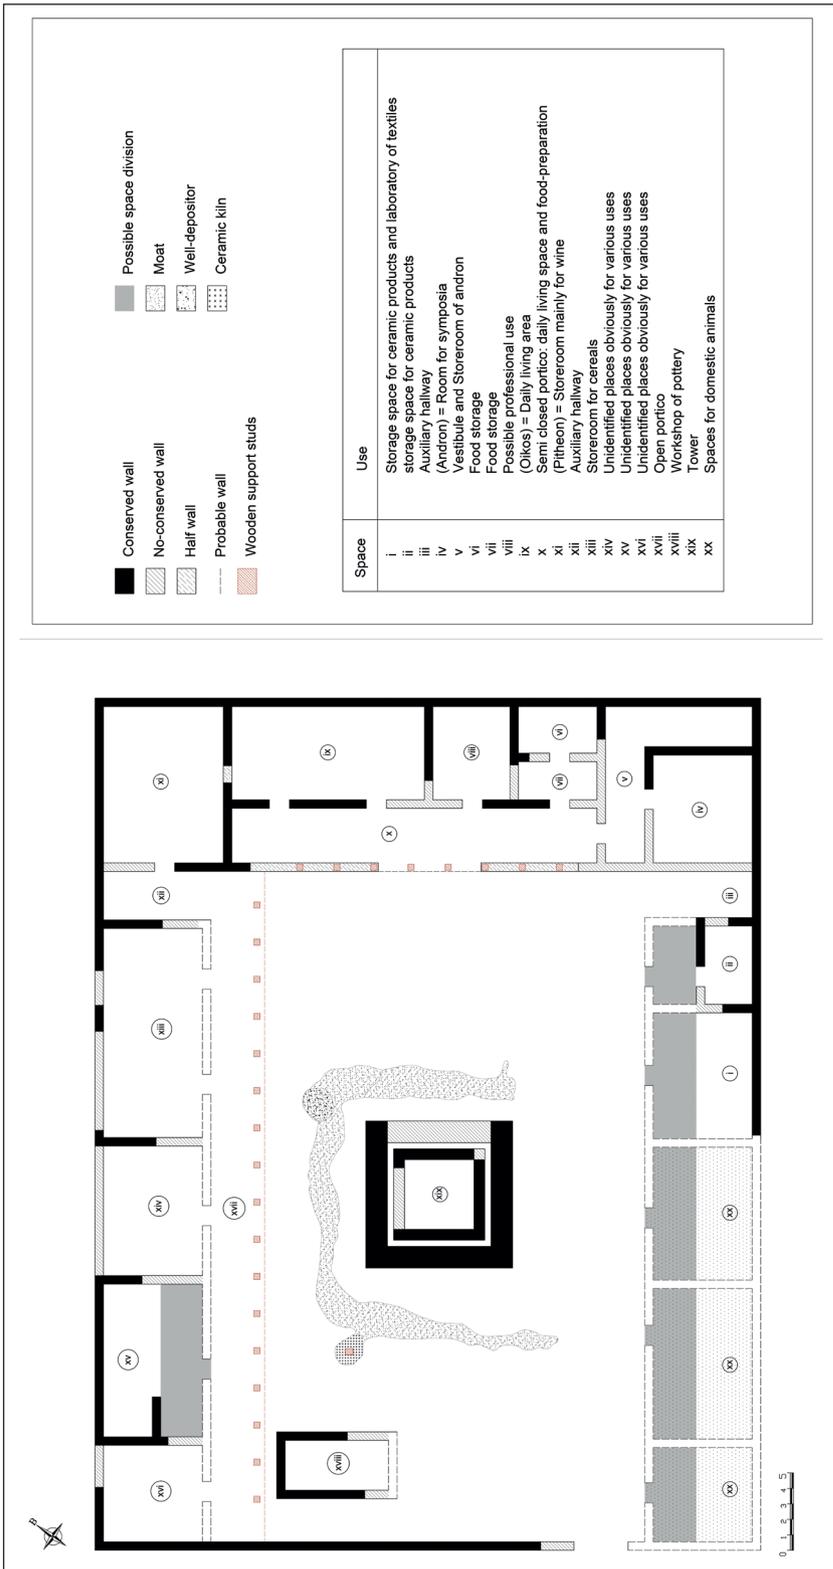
Architectural plan of farmhouse at Tria Platania.
